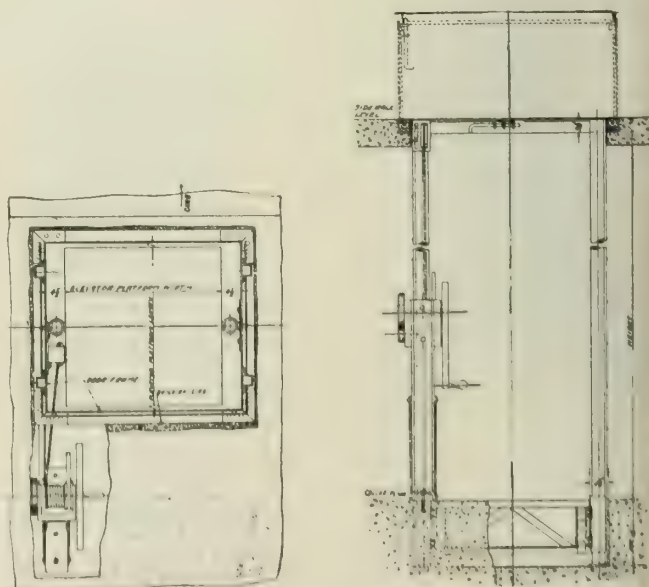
DETAILS TYPE "A" PLATFORM LIFT
